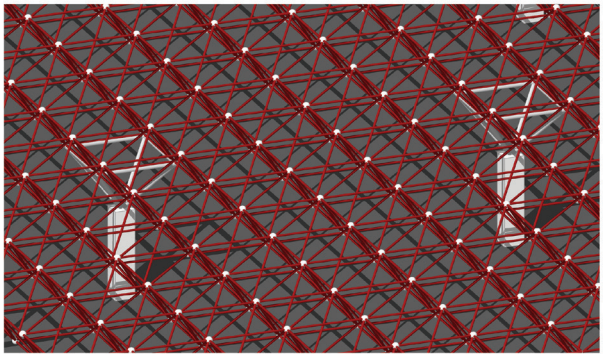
Option #7, two-way space frame truss framing plan and axon
